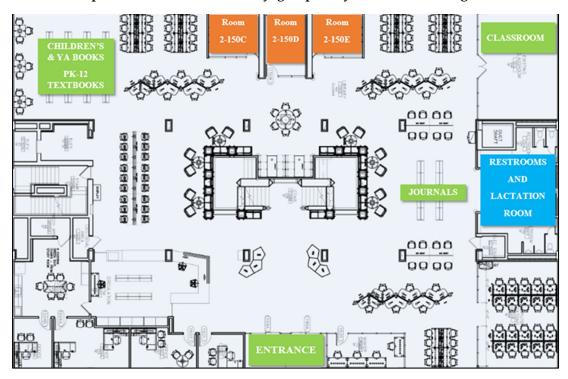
Second floor plan of the Education Library, group study rooms are in orange
